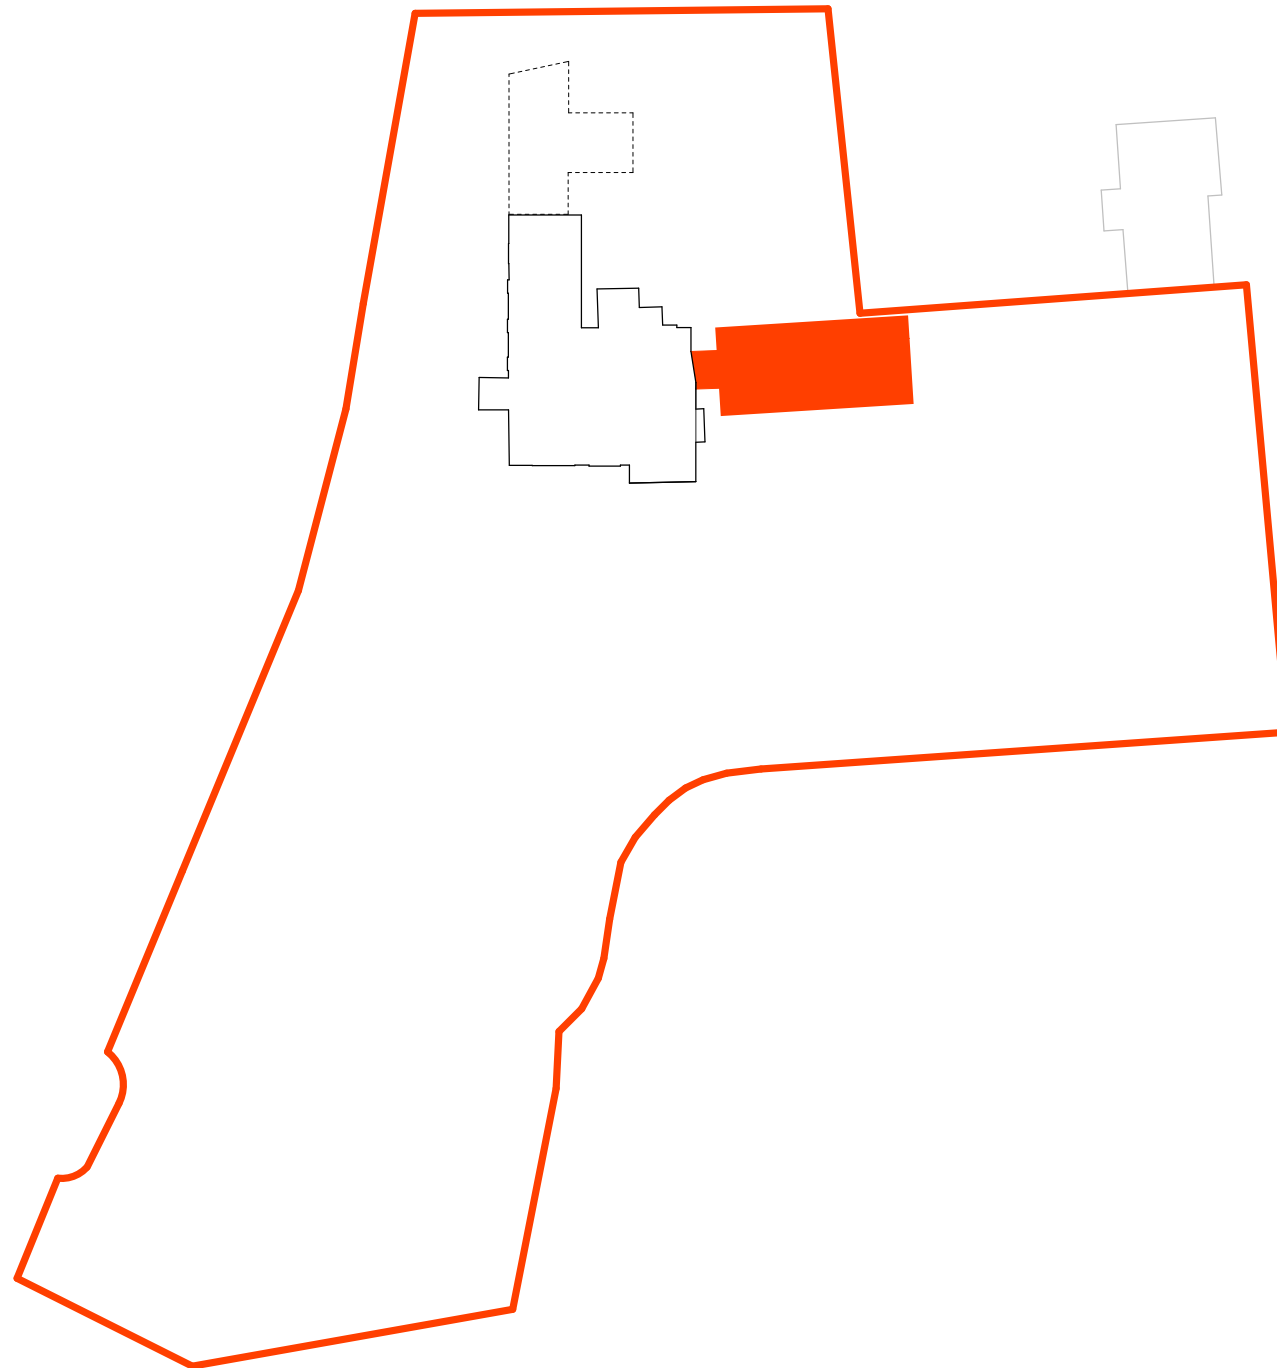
Site Diagram Depicting Site Boundary & Existing Buildings alongside the proposed extension
